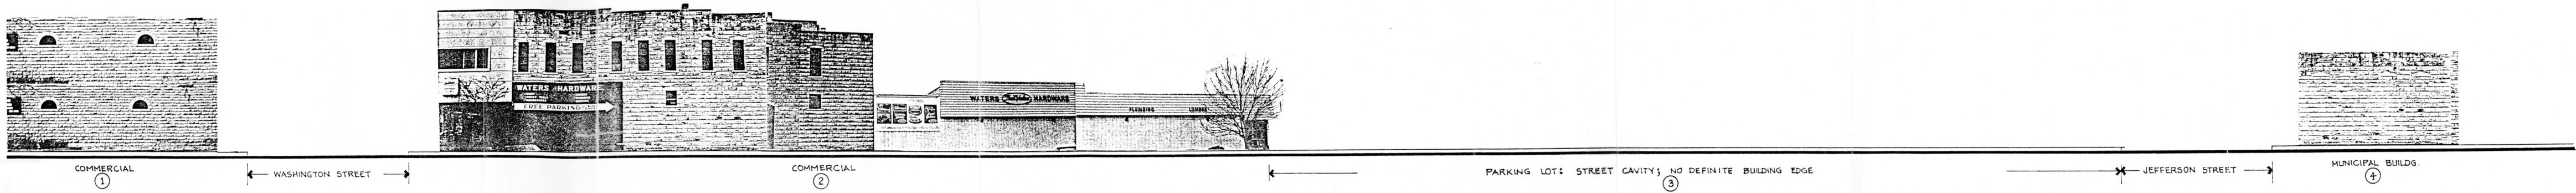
SOUTH ELEVATION FROM EIGHTH STREET
